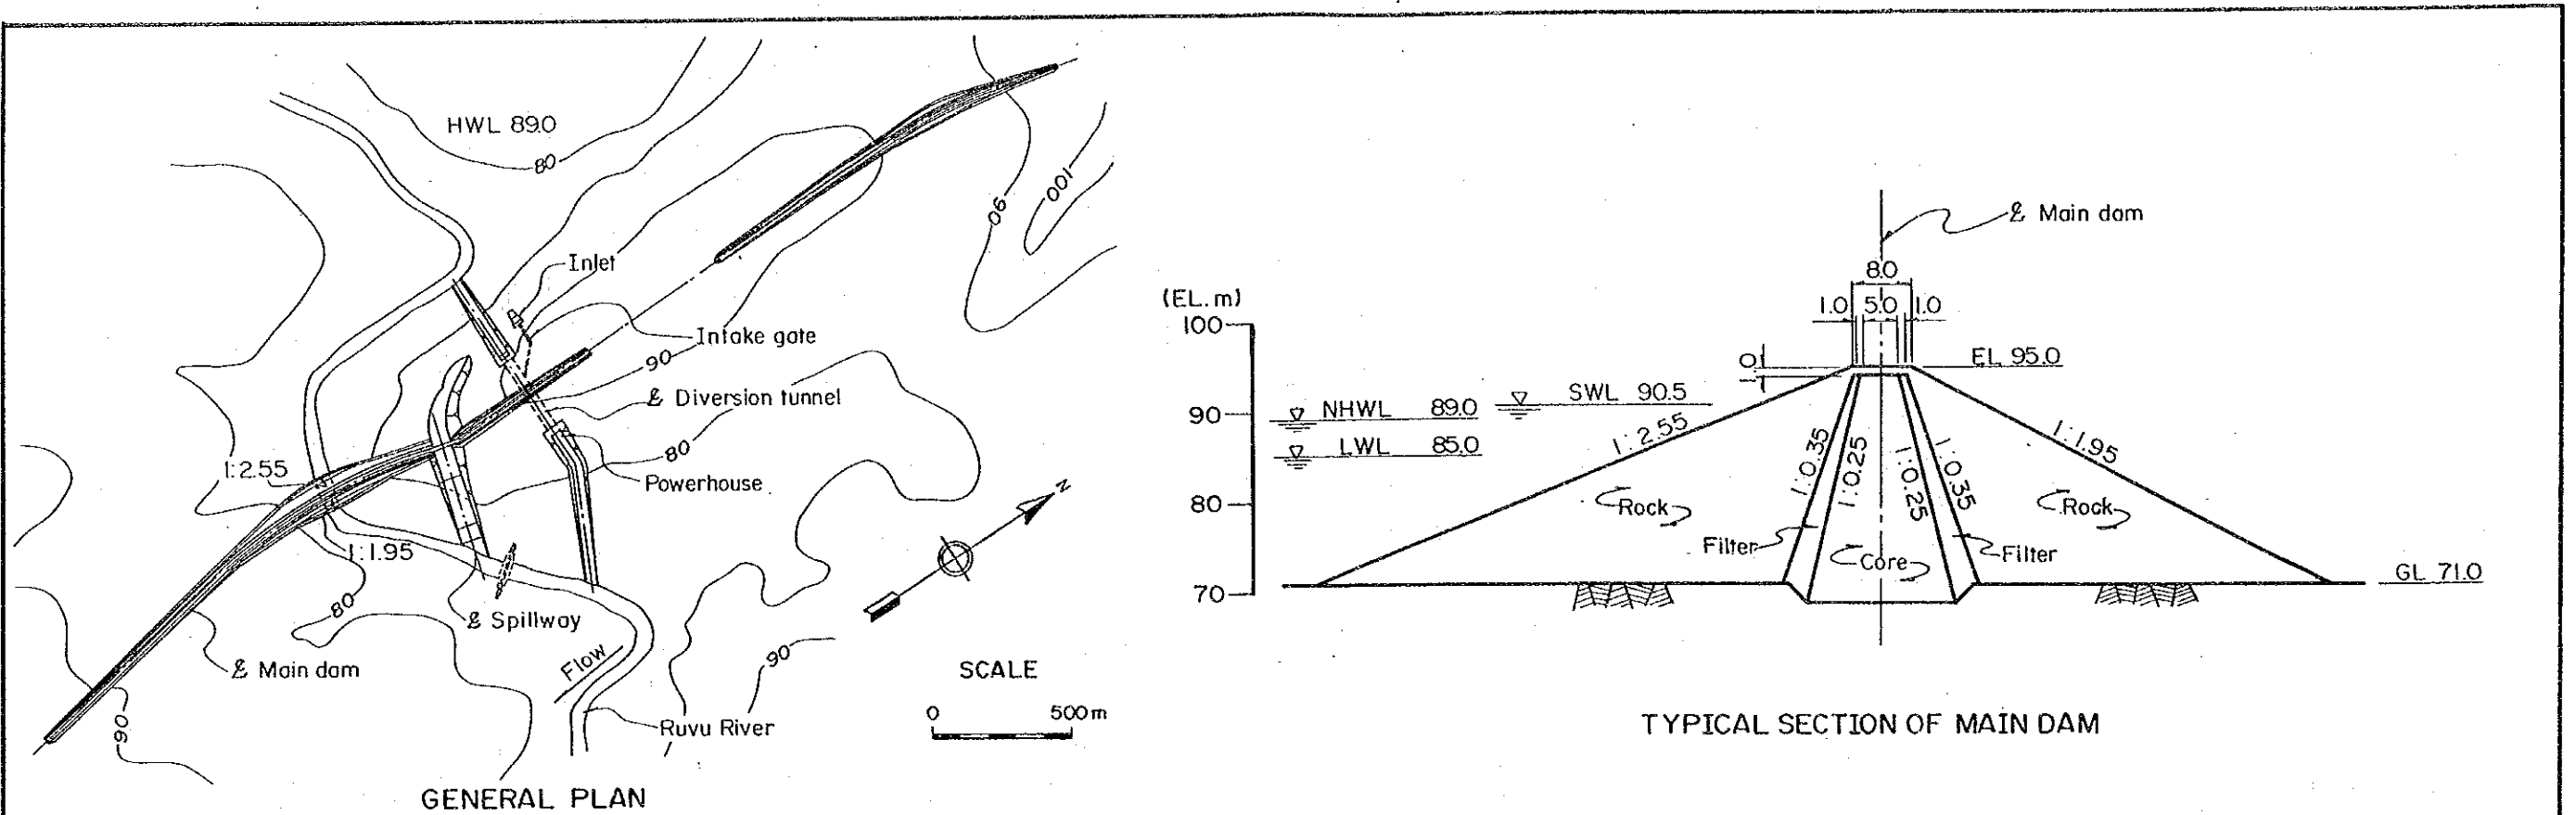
LAYOUT PLAN OF KIDUNDA DAM PROJECT
